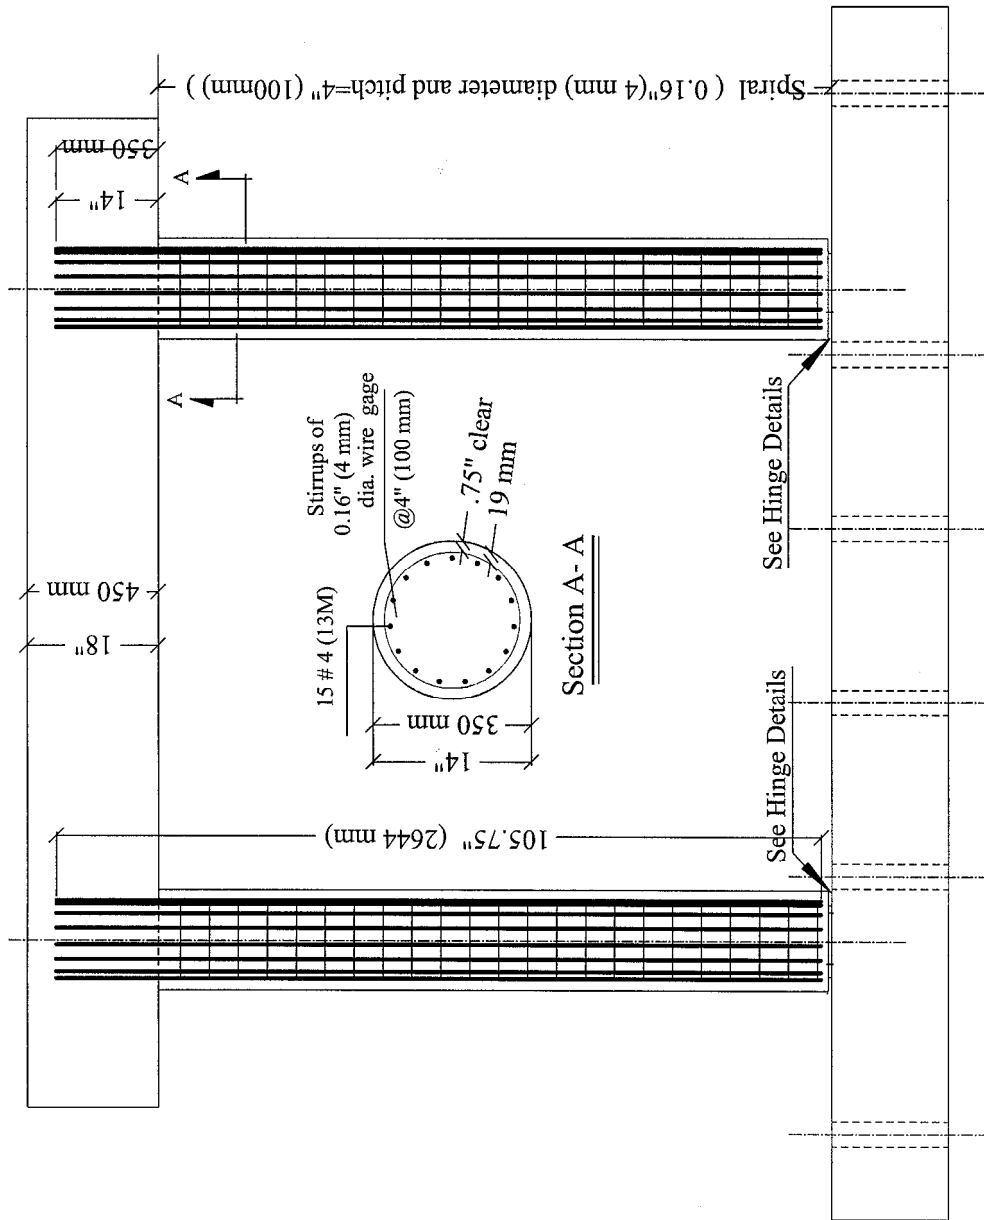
Columns Longitudinal and Transverse Reinf. of As-Built Specimen
